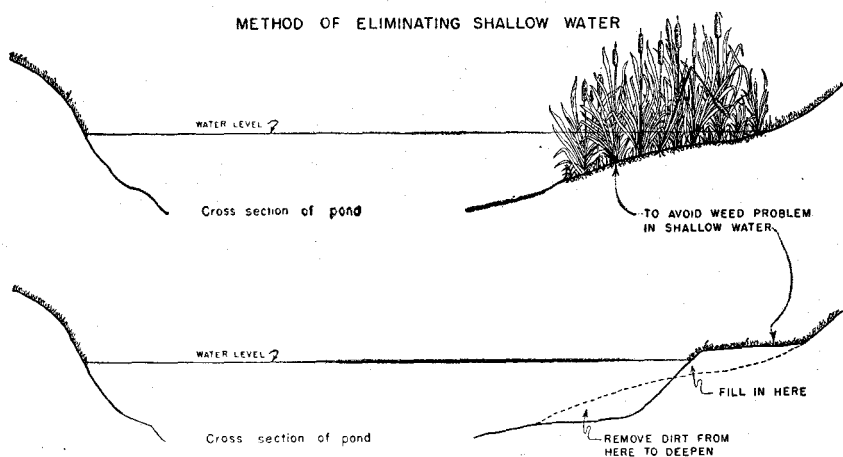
Pond edges should be deepened to control emergent water plants and improve fishing.
